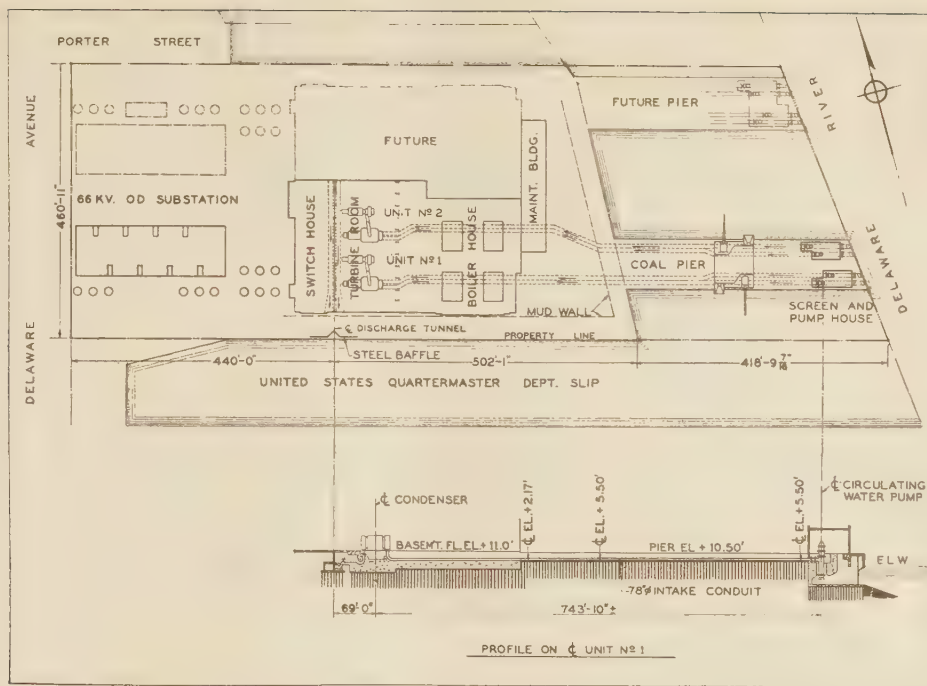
PLOT PLAN AND ELEVATION OF SOUTHWARK STATION
